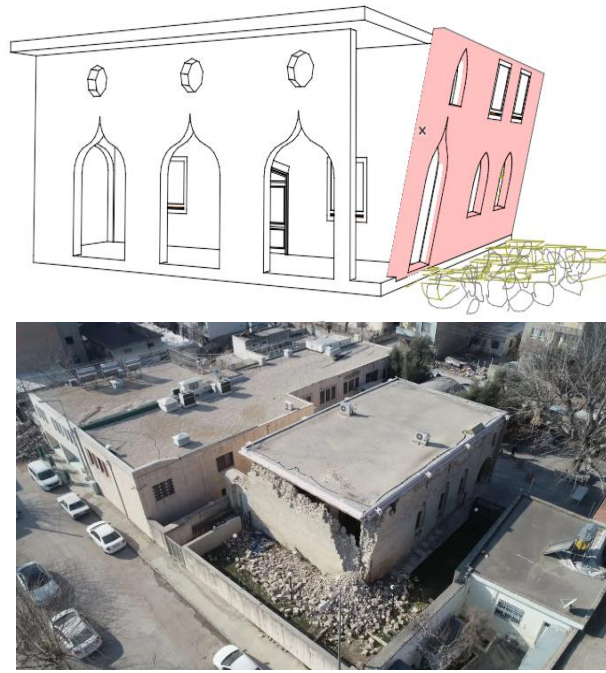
The out-of-plane overturning of the entire wall or a portion of it (2f)
